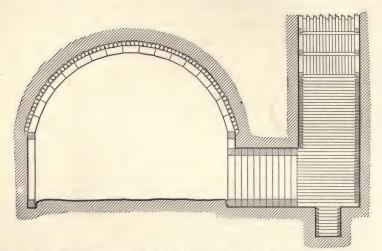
Connection with Shaft, Church Hill Tunnel.
